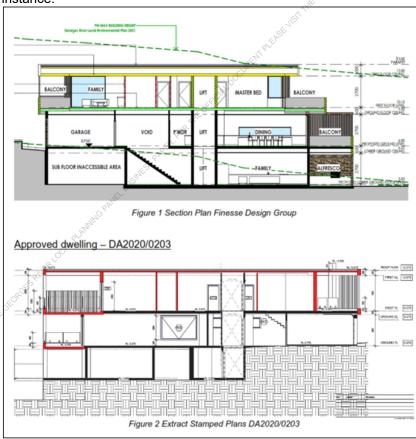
Proposed and approved (DA2020/0203) – extract from architectural section of relevant drawings
